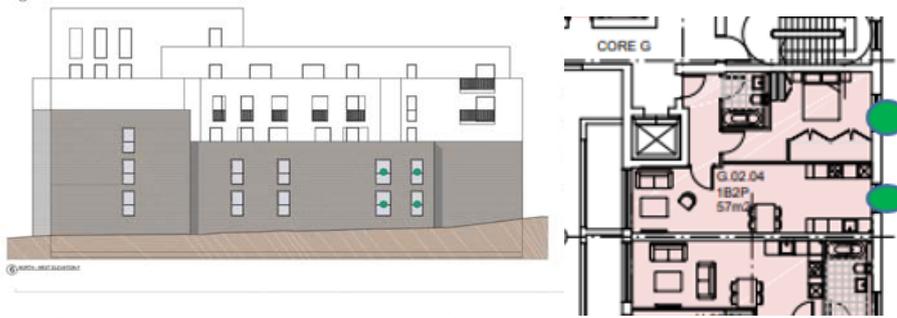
Western elevation of South site of Mosaic Place development and floorplan extract - green dots indicate relevant habitable windows.
